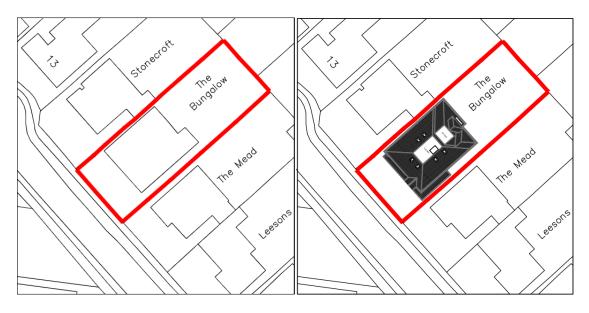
& 5 – Existing (left) and Proposed (right) block plan
